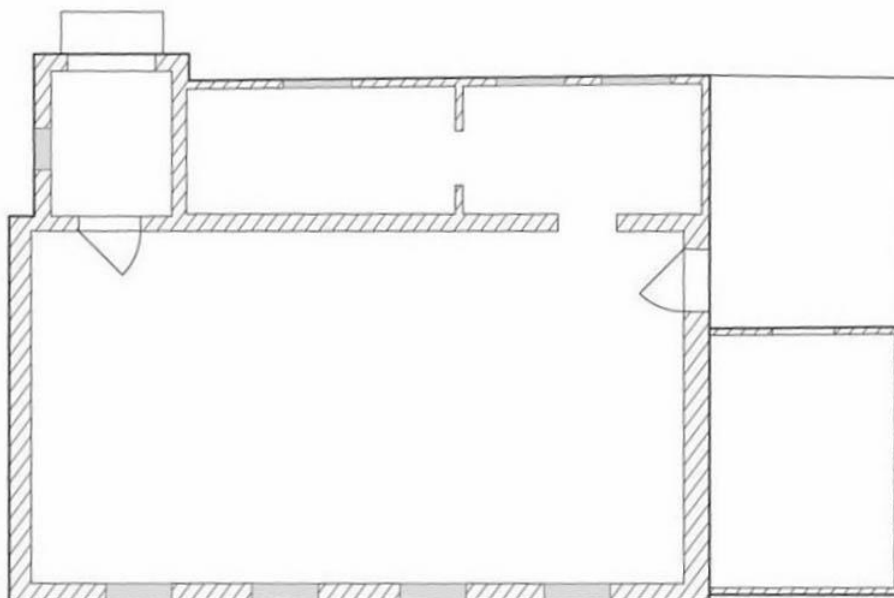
Floor plan showing the internal layout of Upper Castlereagh School. (Source: Craig & Rhodes, 2010)
